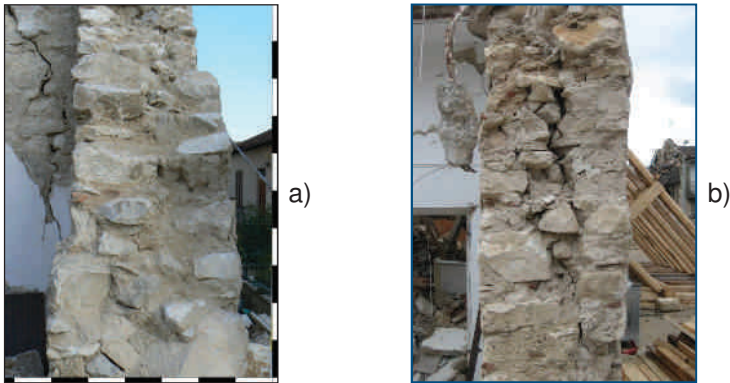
Examples of 2 cross masonry sections of poor residential buildings of Onna, L'Aquila, Abruzzo region: a) no or very few voids are visible and so the wall is not injectable; b) a long vertical crack is visible and so the wall is injectable.
